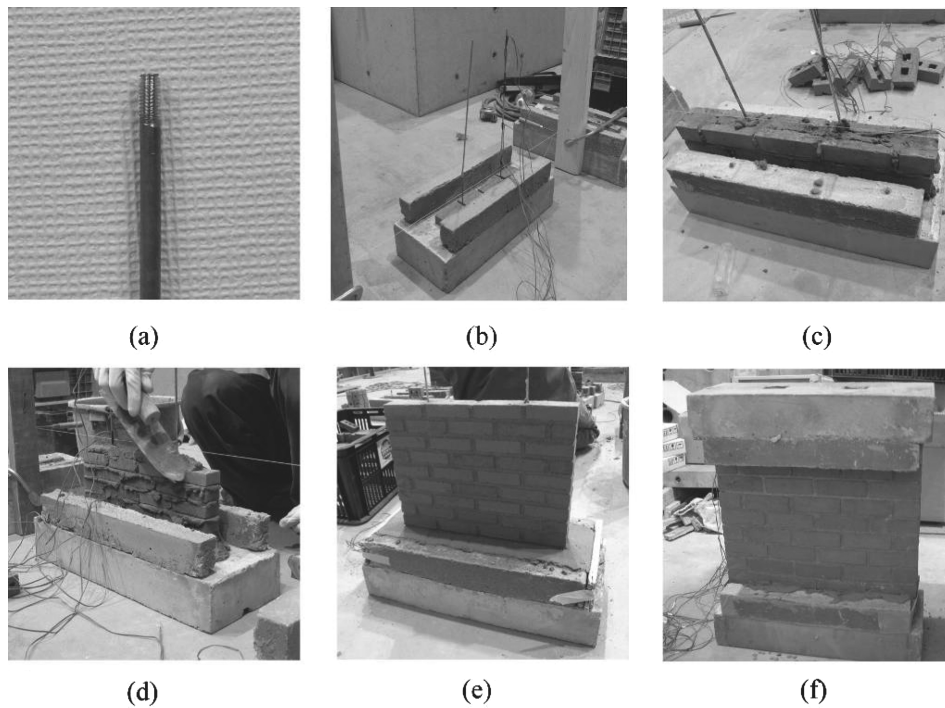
Processes involved during specimen preparation: (a) threaded SMA bar, (b) concrete block with SMA bar inserted, (c) position of coupler connecting SMA bar and stainless steel bar, (d) brick laying, (e) completion of brick laying and (f) placement of concrete block support on the top of specimen
